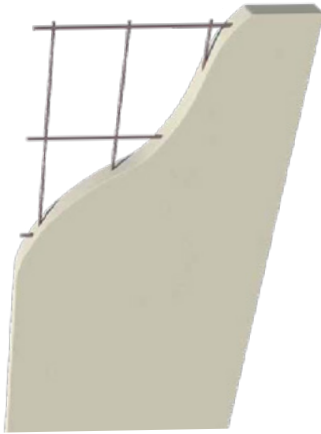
External Wall Cladding System Overview (Vertical Installation)
